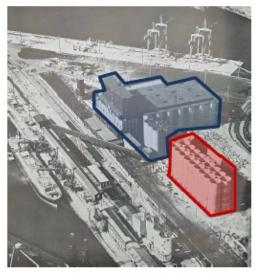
Sydney Terminal Elevator, Glebe Island. Aerial view showing the southern end of the new storage bins, shown red, under construction, July 1972. The yet to be demolished original silos are shown blue. (Source: 50 Years of Bulk Grain Handling in New South Wales)
